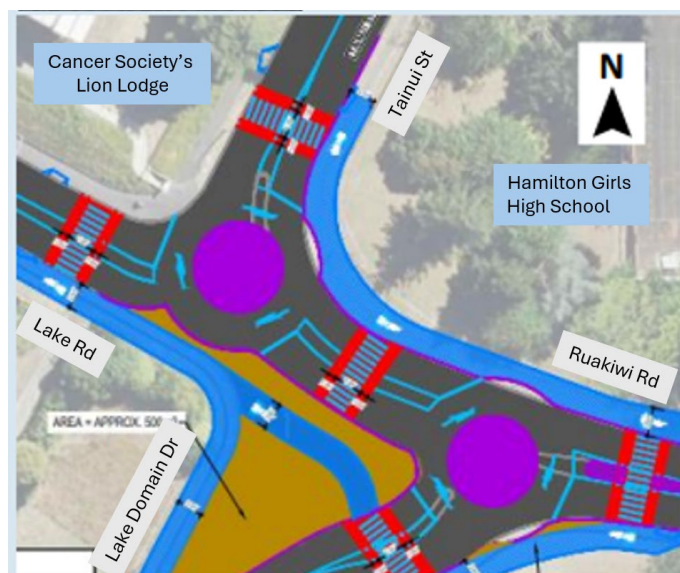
concept layout for double roundabouts at Lake Domain Drive, Ruakiwi Road and Tainui Street intersection
